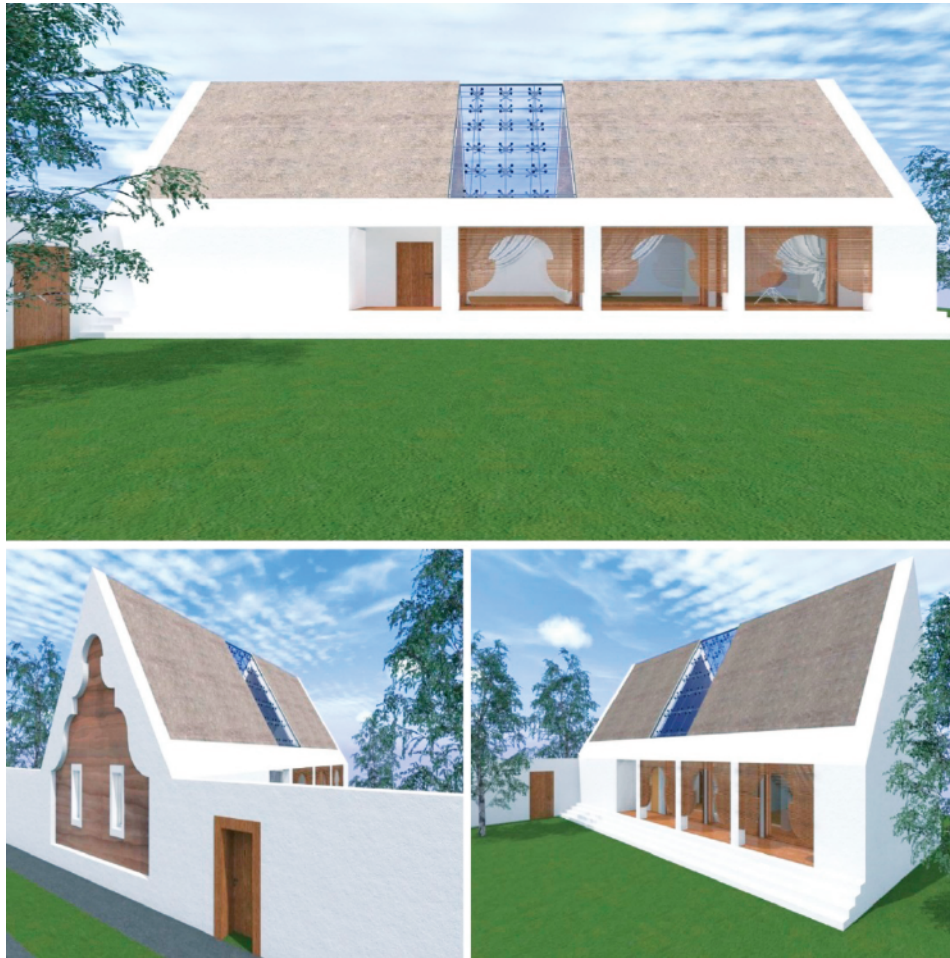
North Serbia, Vojvodina House Type, elevation views (2016) by ArhiArhi (Predrag, Vladimir and Grigor Milošević) (Source: authors archive)
